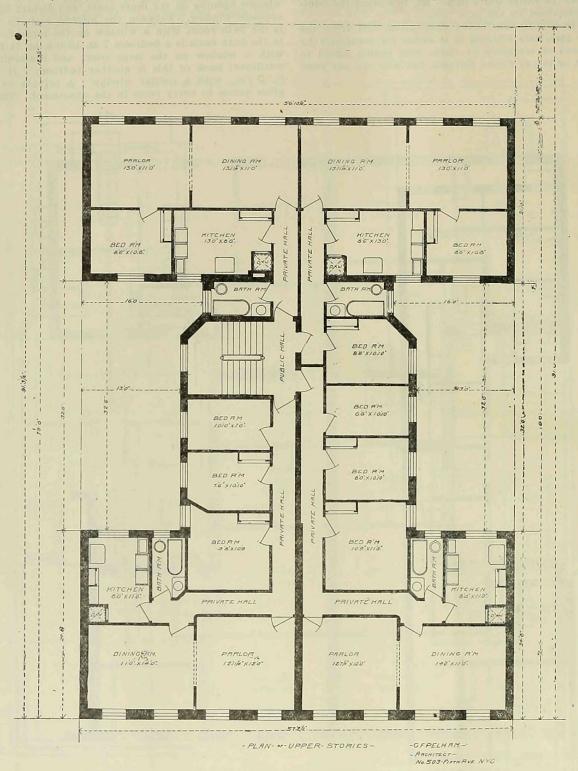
NO. 6-10 BARROW STREET, NEW LAW FLAT.
